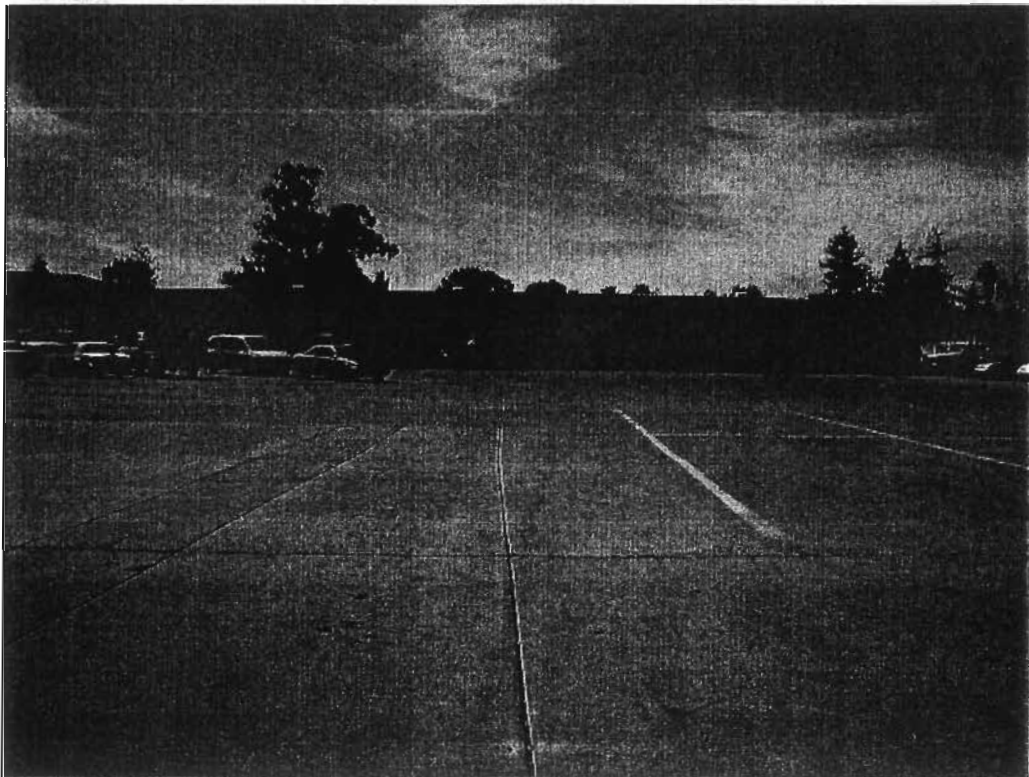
View of the on-site building utilized for storage of owner's items and restaurant equipment.
